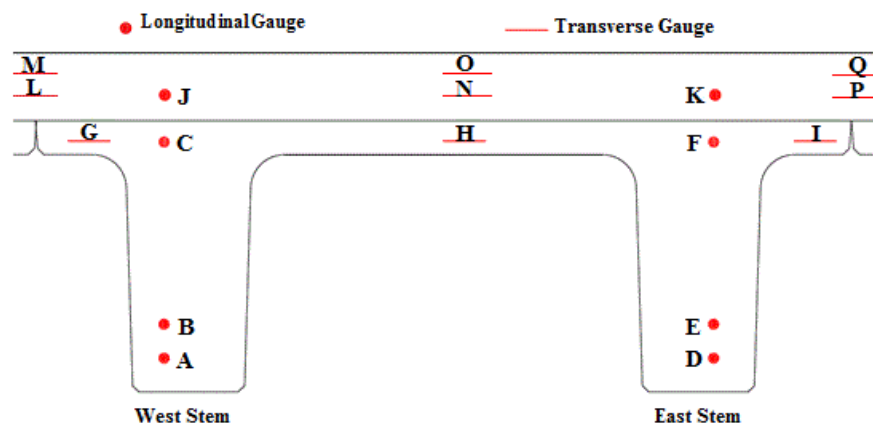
Generic Strain Gauge Locations in Beam Cross-section
